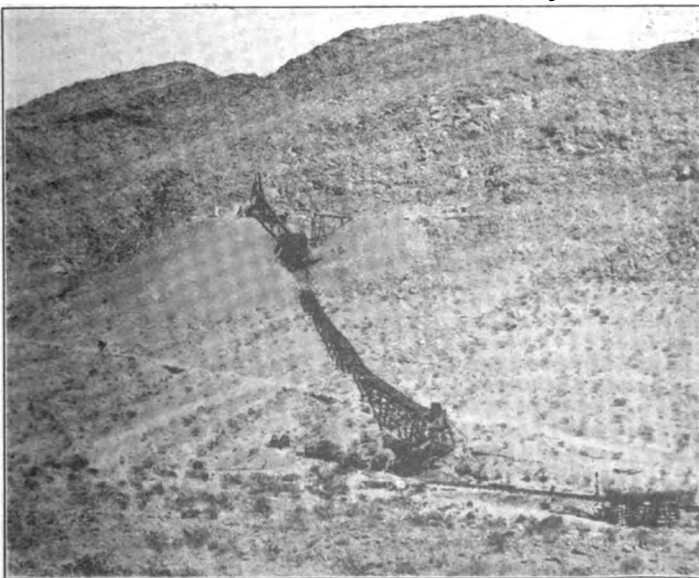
Gravity tram and ore bin at Noonday Mine.
